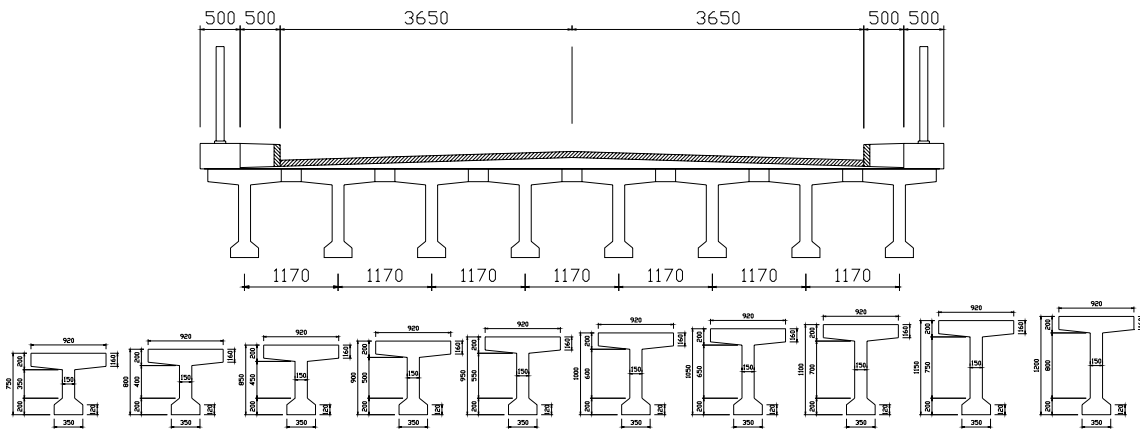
Typical two lanes girder bridge of T-shape with heavy bottom flange (8 girders)
